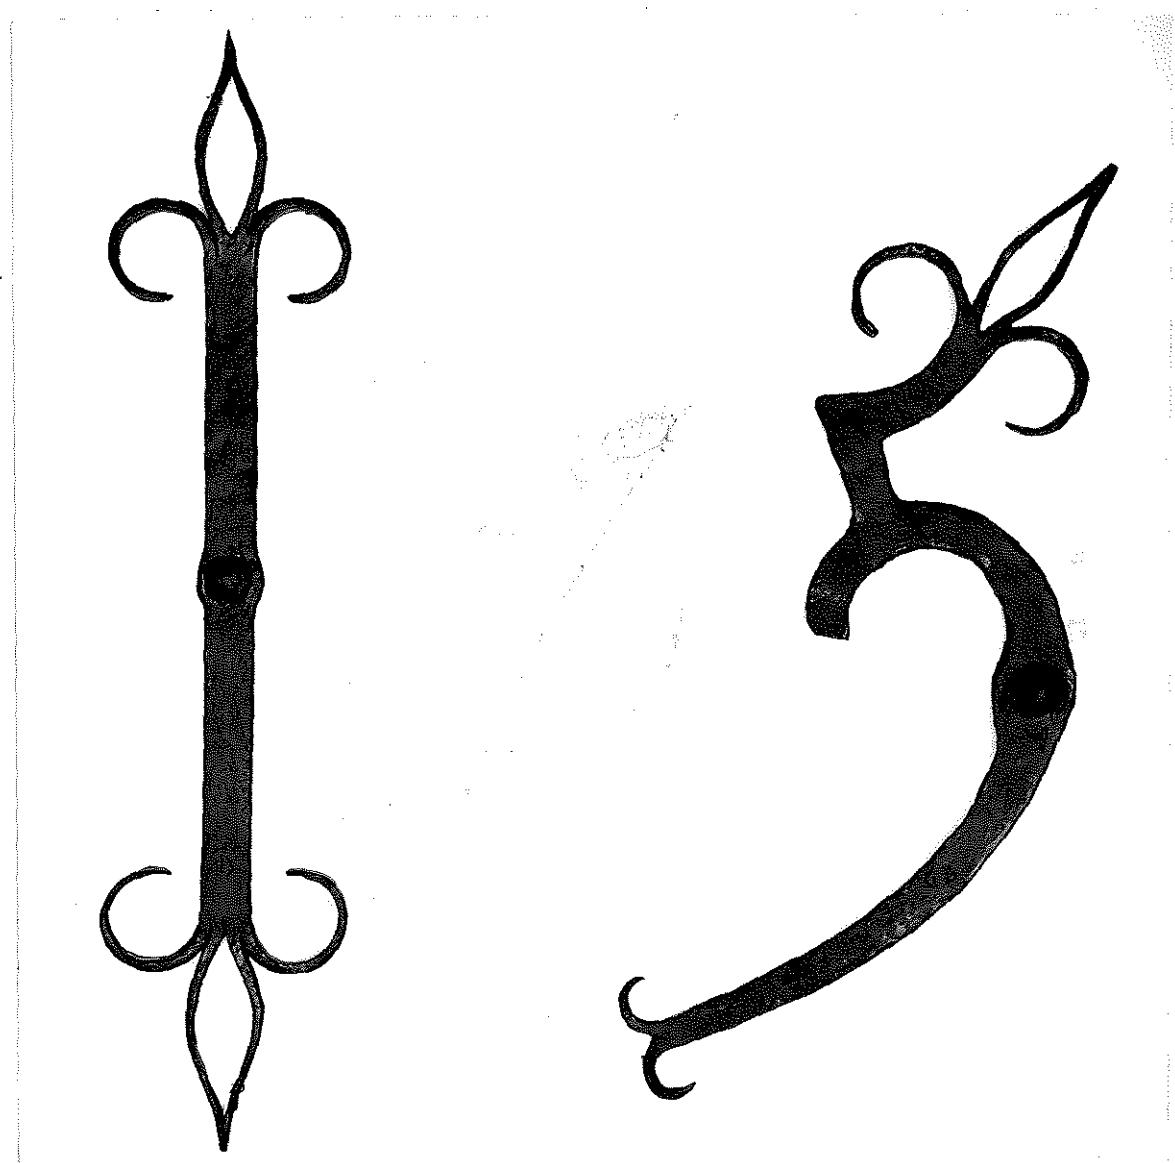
Two "short wall ties", Great Yarmouth, 156.... The final digit was missing from this oldest and largest set of wall anchors known from the town.
